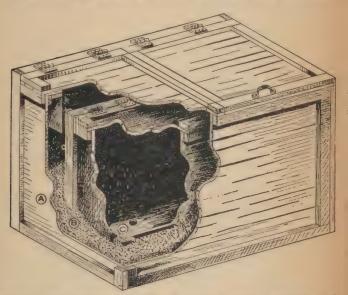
Underground ice or cooling box. A—Outer wall. B—Insulating material. C—Inner wall.
